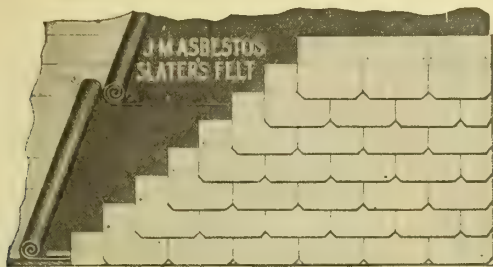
CLIPPED CORNER AMERICAN METHOD
